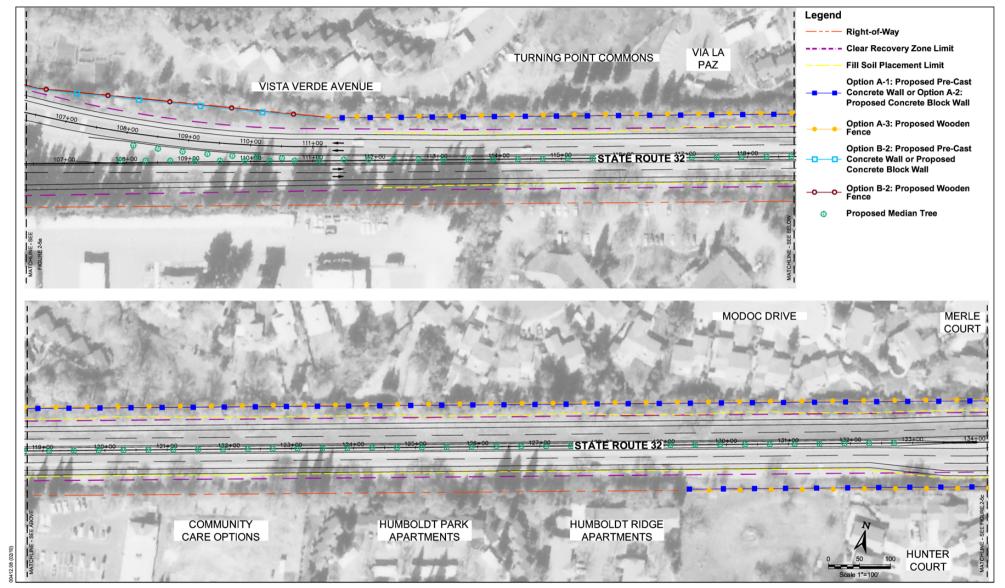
Timber Barrier Alternative, including Proposed Sound Barrier
